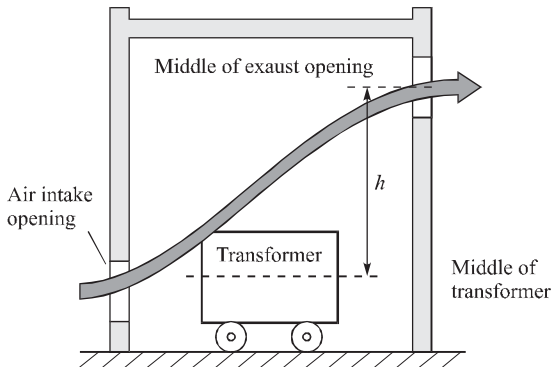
Ventilation for the interior installation of a cast resin transformer [45]
